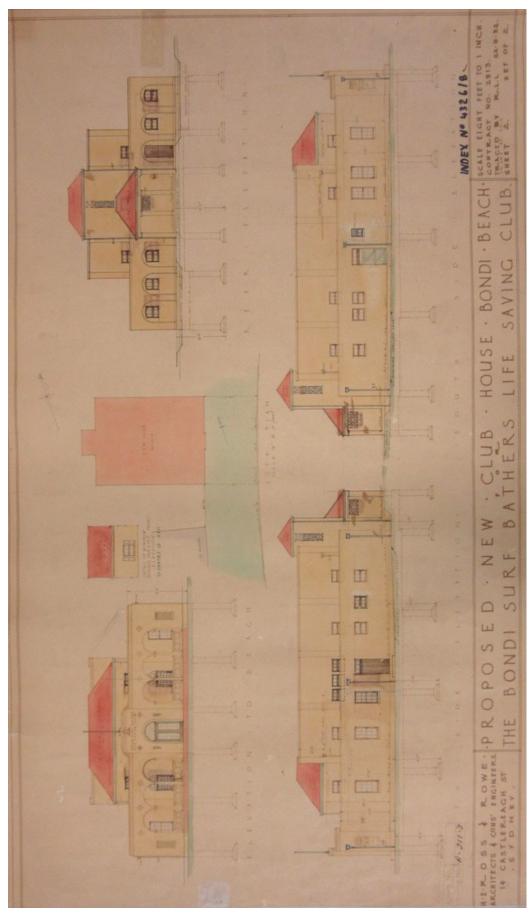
Drawing showing the original design of the surf club with the side rooms having flat roofs The front elevation is similar to the revised scheme but the walls of the sunbaking terrace are exposed on the side elevations. Source: Jean Rice Architect, photographed at WLS.
